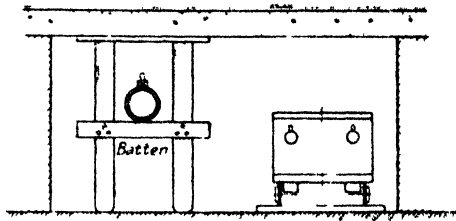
SECTION OF ROAD SHOWING POSITION OF AIR TIRE
